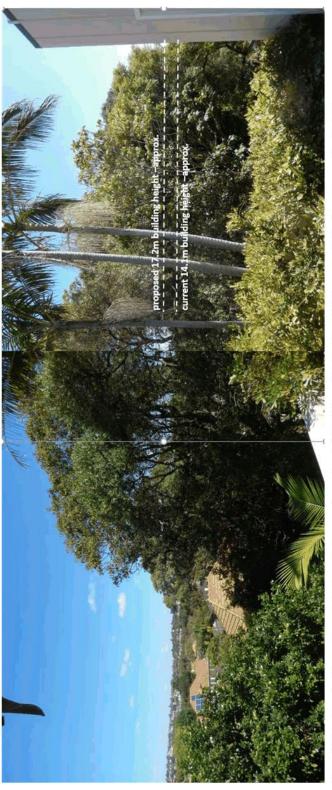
The view standing on the main bedroom balcony on the top level of 4/37 Dover Road looking WNW over the Wilberforce Avenue Car Park site.
